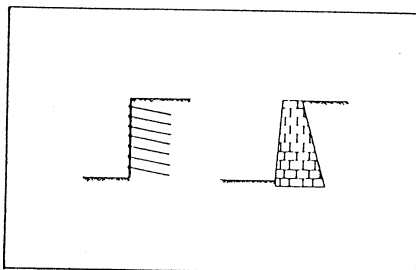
The analogy between a gravity wall and nailed soil structure (Stocker et al 1979)
